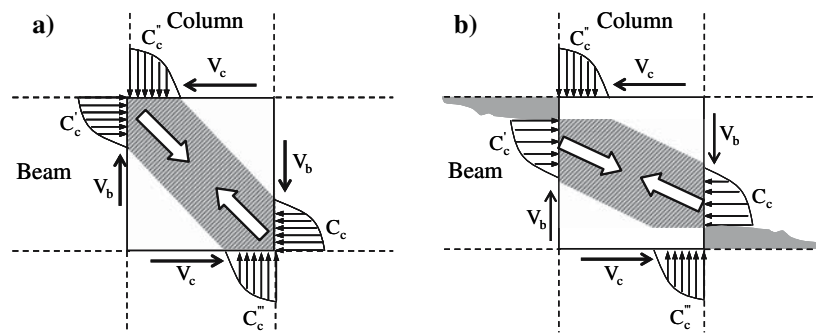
Change in strut geometry after spalling of beam section. (a) Concrete diagonal strut. (b) Concrete strut after spalling of beam section
